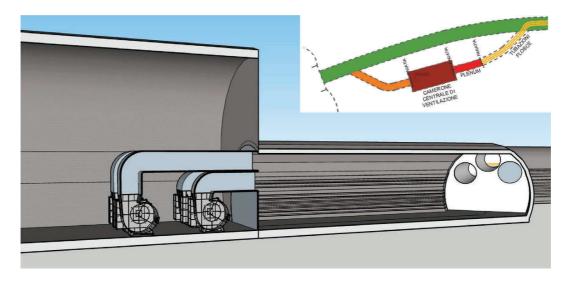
Typical installation lay-out of ventilation ducts interfaced to a ventilation plenum.
